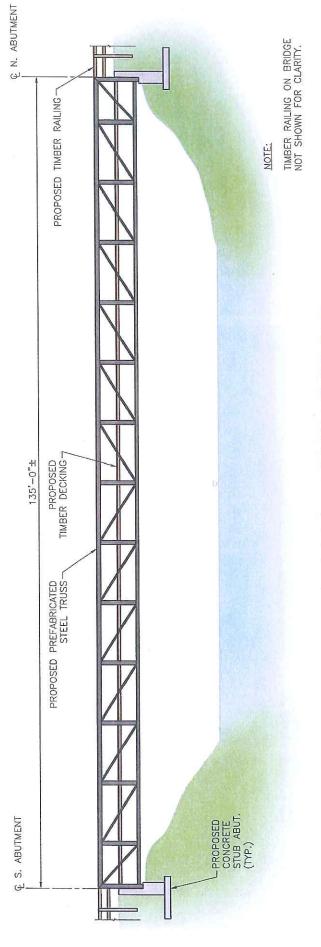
Alternative 2 – Replacement with Prefabricated Steel Bridge Structure Elevation View
